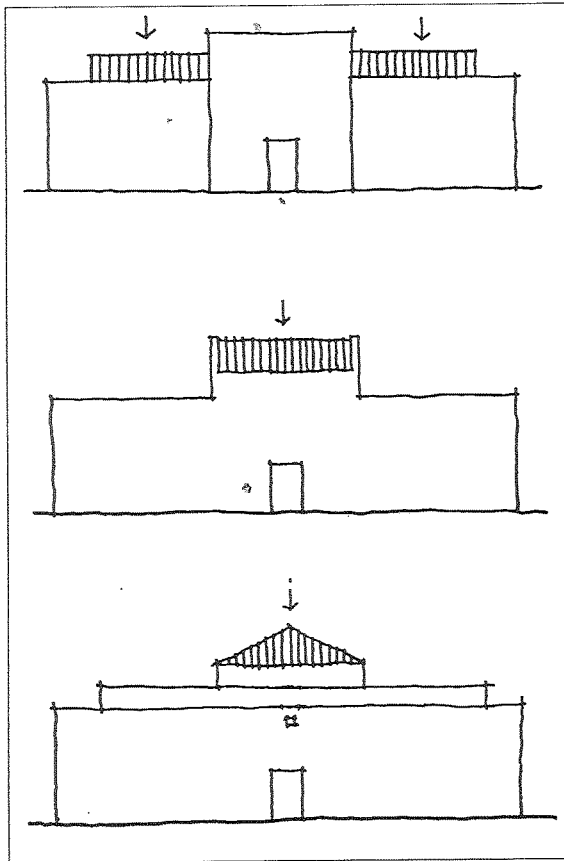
, Rooftop Equipment. Roof features such as cupolas and parapets can serve as camouflage for rooftop mechanical equipment.
